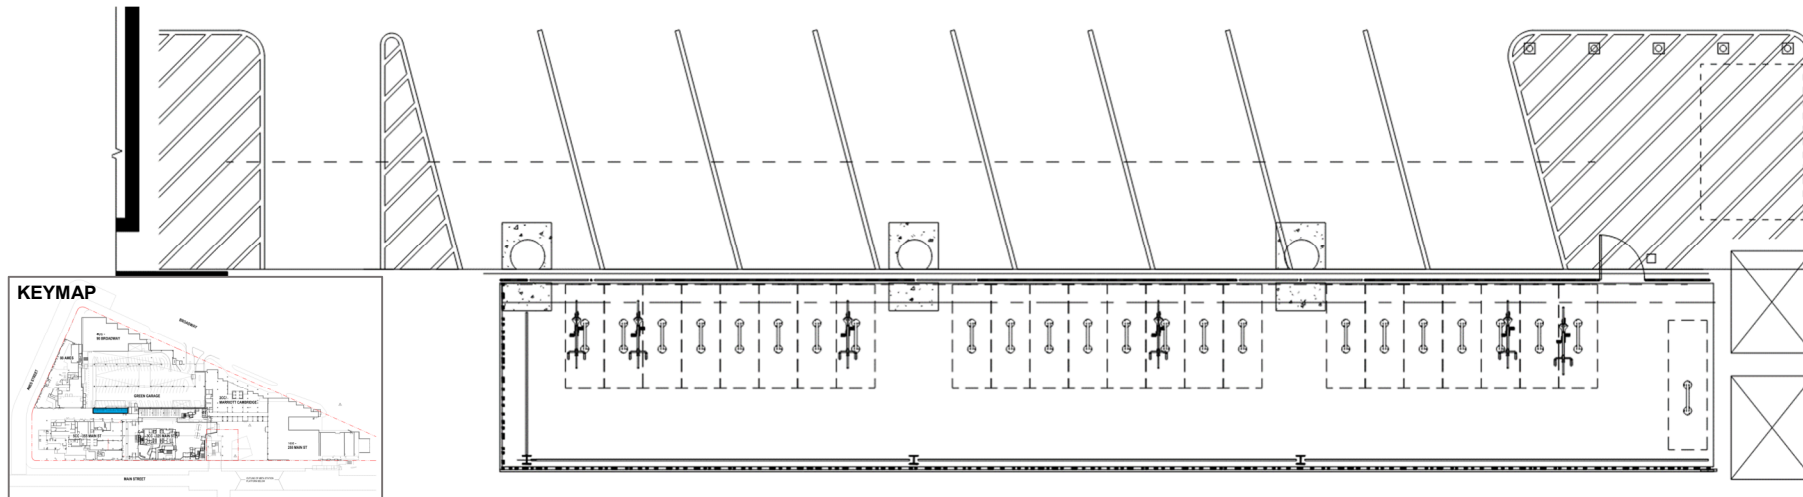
Exhibit B: Existing Bike Parking at 88 Ames Street Page 2 of 3
